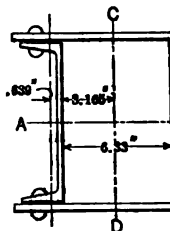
Moment of Inertia of Cross-section of and-channel Box Column
